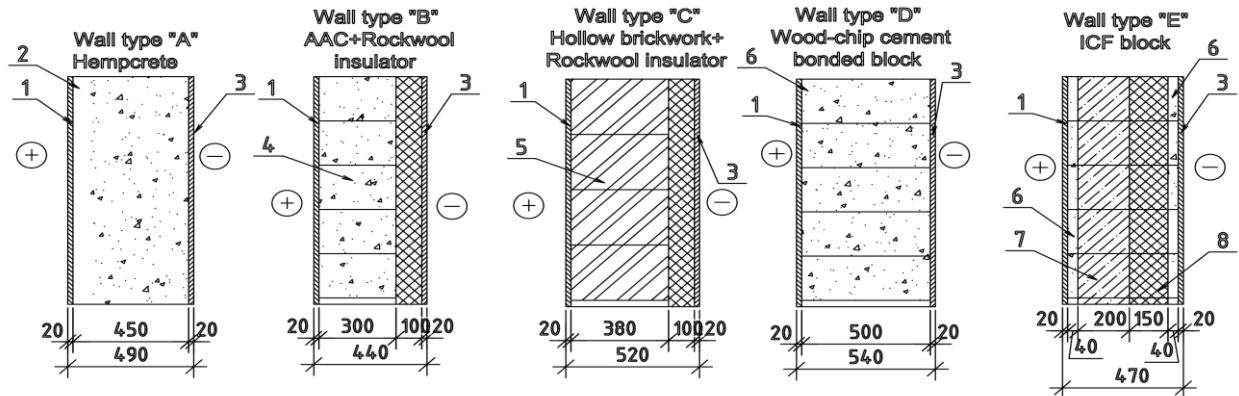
Cross-sectional scheme of investigated wall assemblies: (1 – internal lime-sand plaster, 2 – hempcrete, 3 - external lime-sand plaster, 4 – aerated autoclaved concrete (AAC), 5 – hollow brickwork, 6 – wood-chip cement bonded block (woodcrete), 7 – reinforced concrete, 8 – BASF Neopor insulator)
